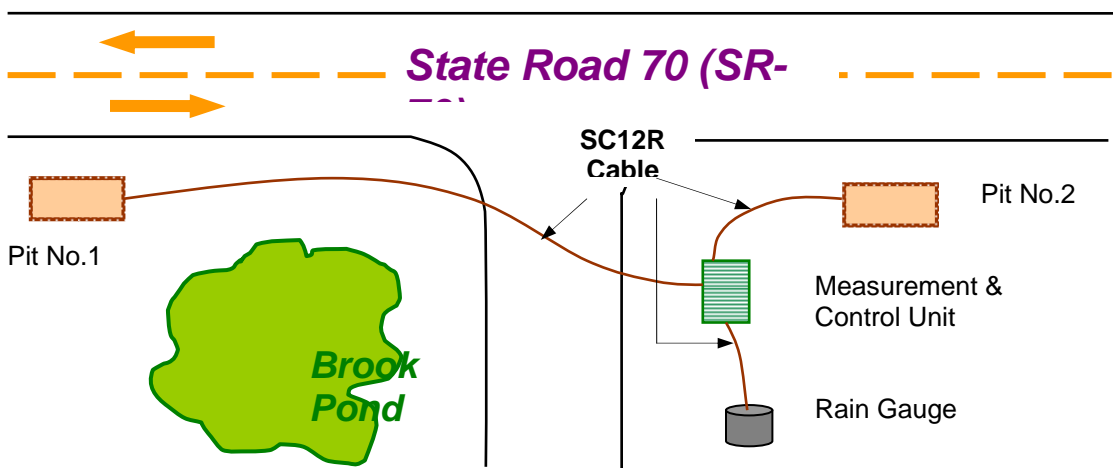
Plan View of Field Installation near Fort Pierce, Florida
